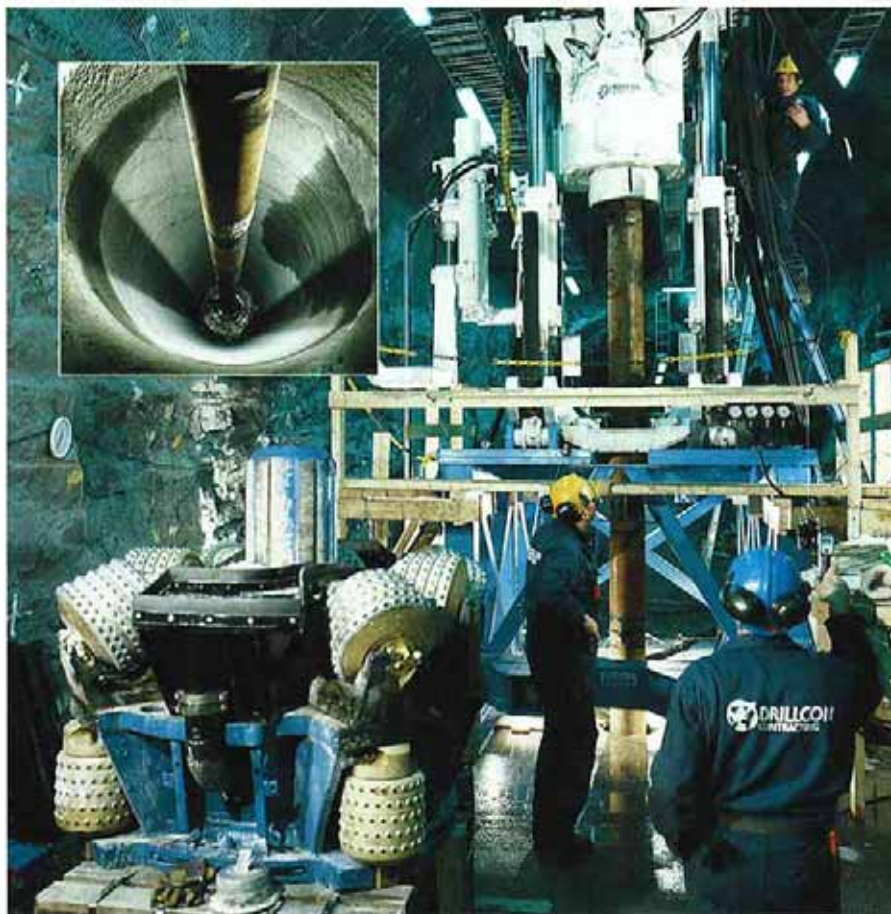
Canister holes can be bored using the full-face boring method. Photo of test boring being carried out in the research tunnel at Olkiluoto.
